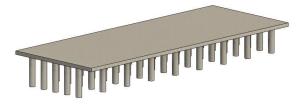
Step 5: Formation of a 50 cm Concrete Slab
